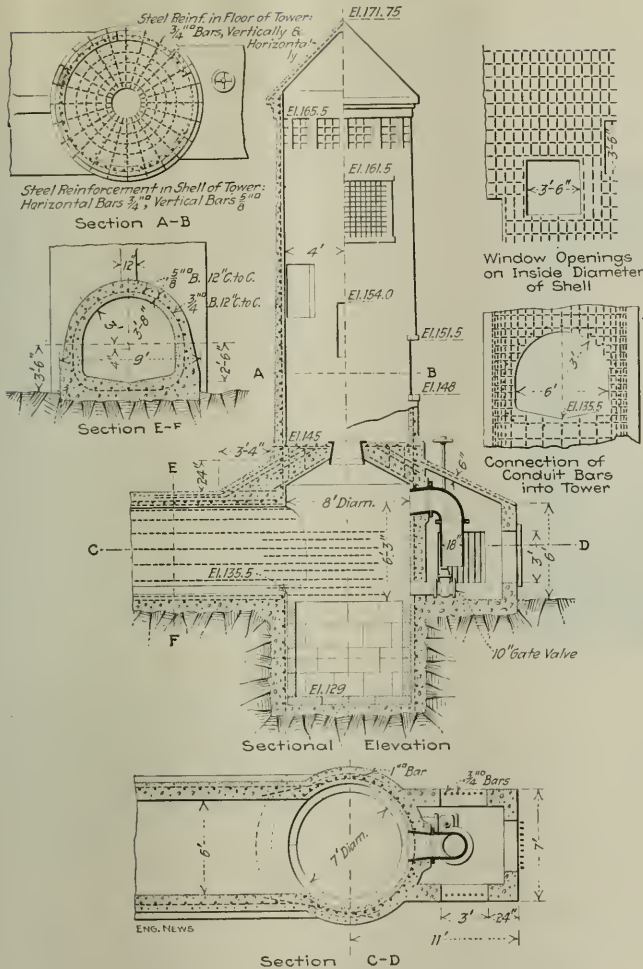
DETAILS OF REINFORCED-CONCRETE INTAKE TOWER
